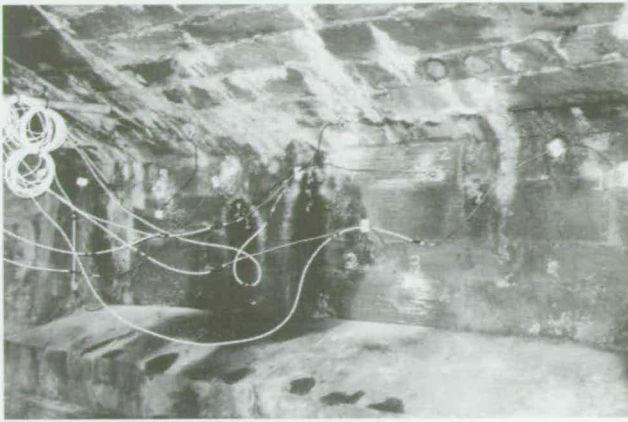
Sensors fixed to west spring wall of masonry arch.
